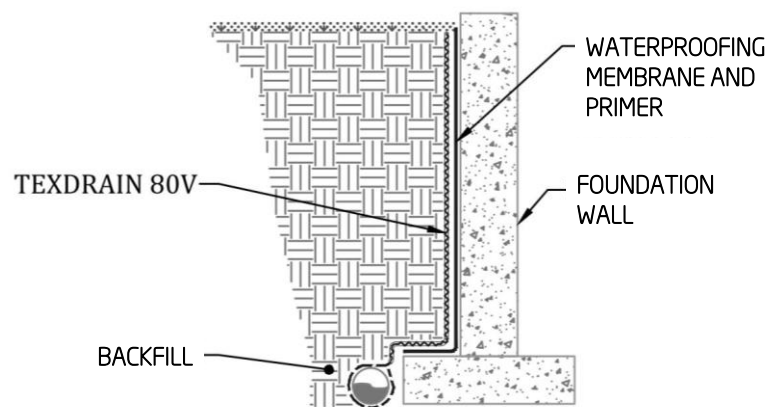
Cross-section of TEXDRAIN 80V for use with foundation walls
